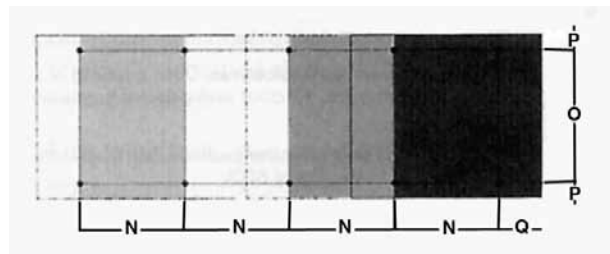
Pad and anchor bolt dimensions. Recommended anchor bolts to be 5/8" diameter, extending 1-1/2" minimum above pad. Cable entrance should be provided as required.
